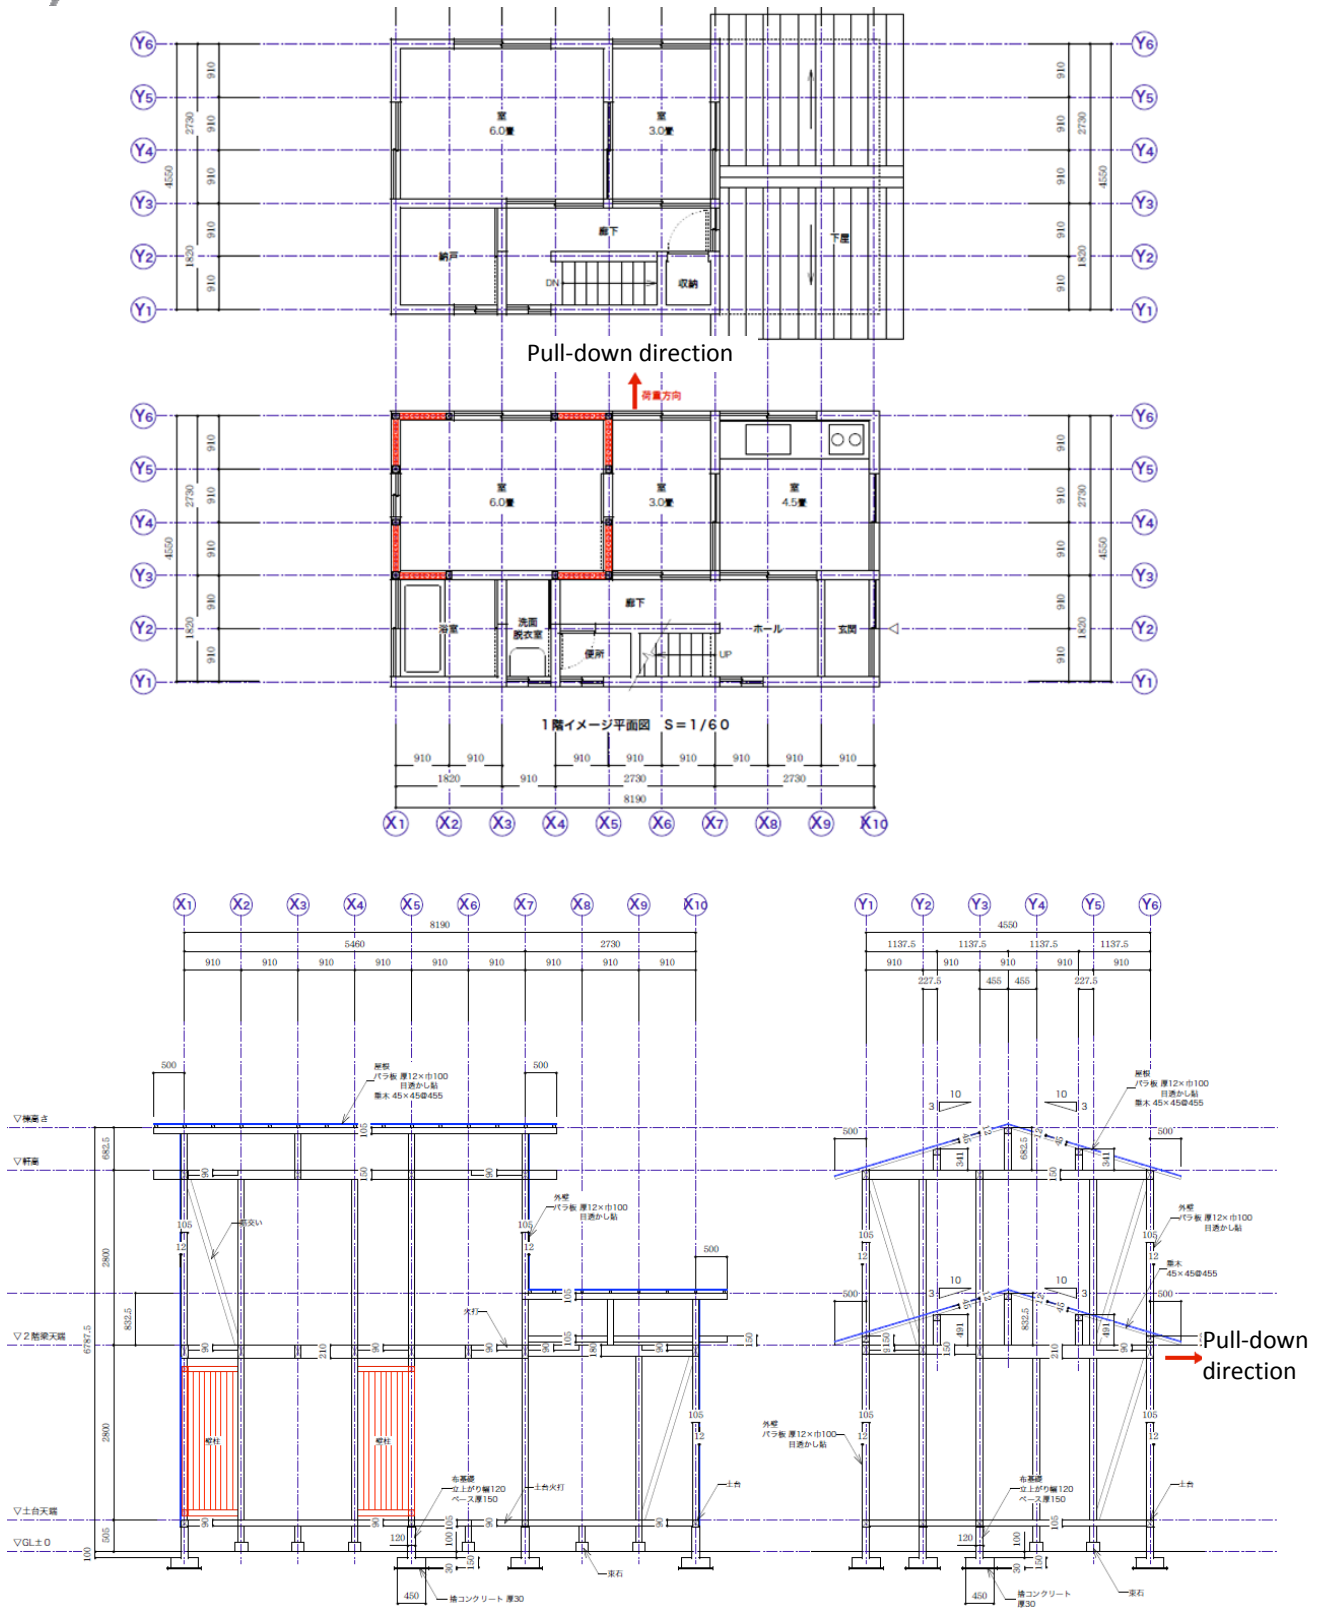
Horizontal plan and elevation plan of the full-sized specimen with WoC.
